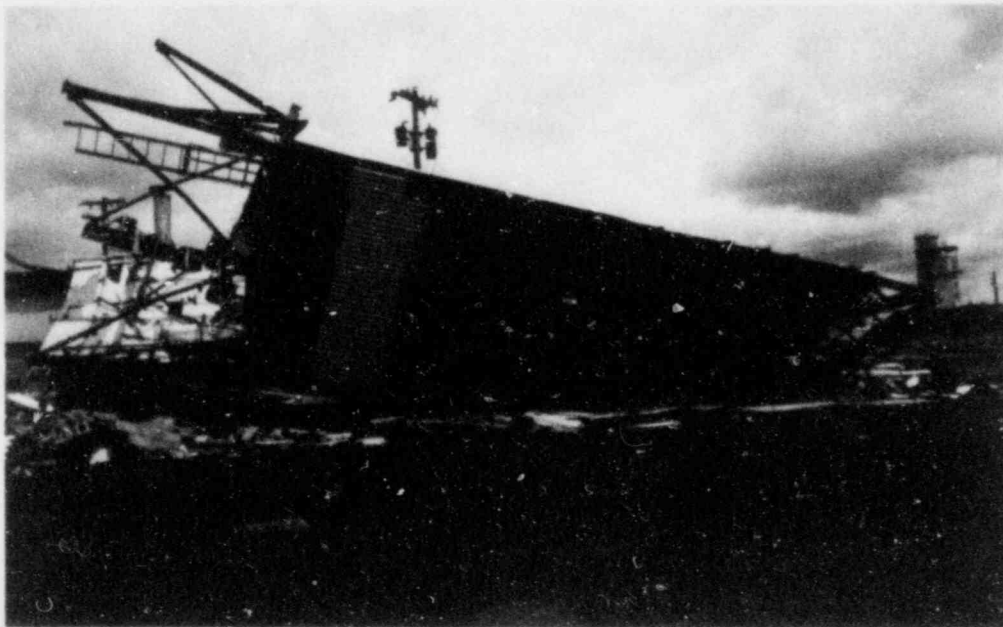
OVERTURNED PARACHUTE DRYING TOWER (failure initiated when anchor bolts in two of the corner columns failed in tension).
